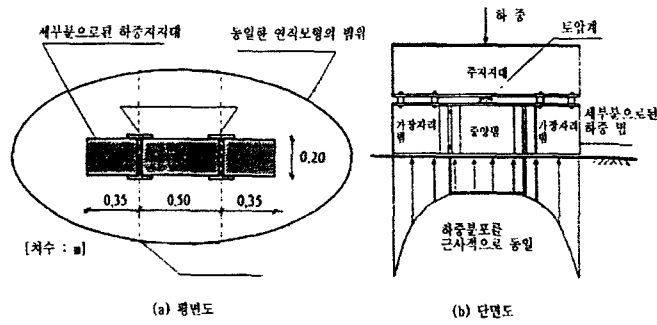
Plan and section view of Large in-situ Load Test Equipment (Floss et al. 1993)
